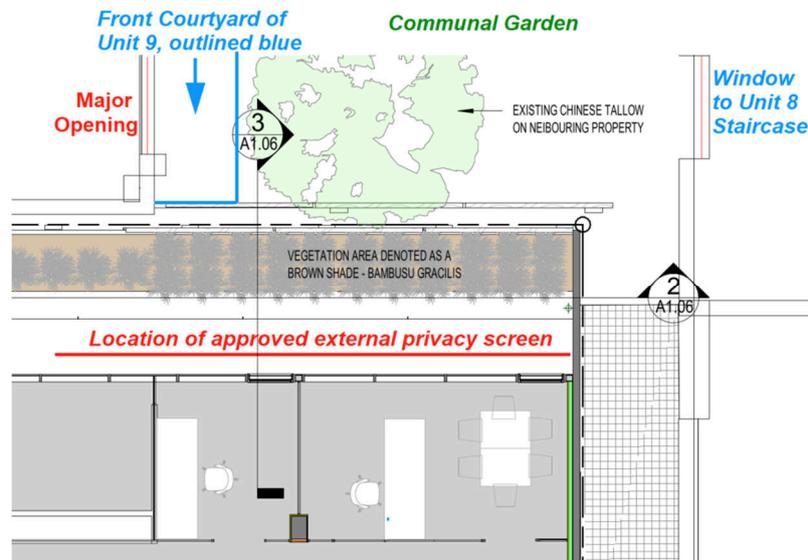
Ground floor plan of No. 276 Newcastle Street showing context of proposed bamboo landscaping screening
